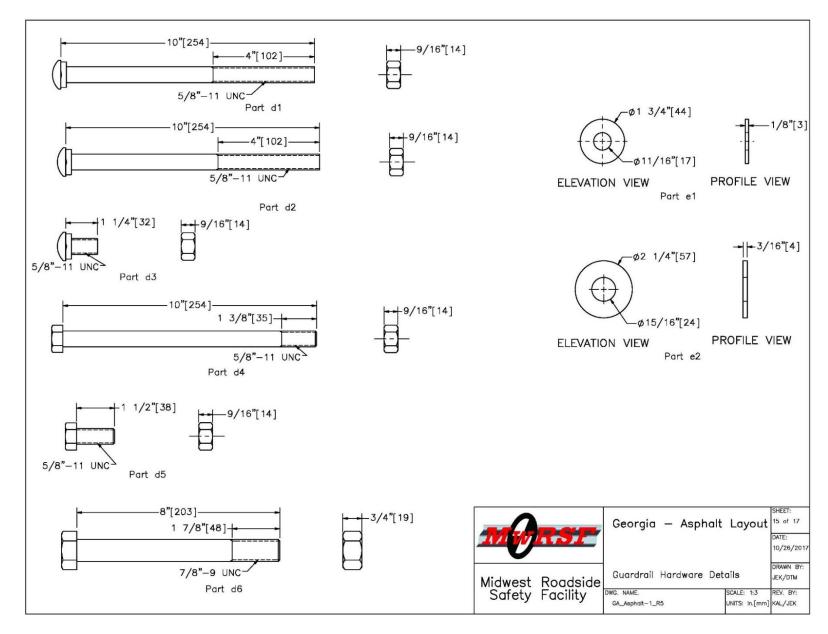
Guardrail Hardware Details, Test No. GAA-1
